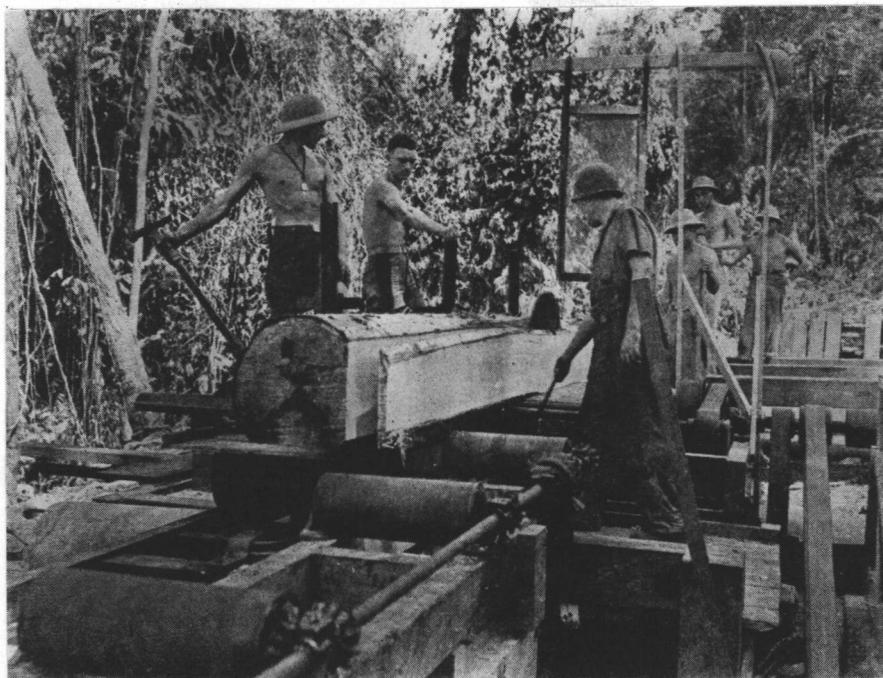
Seabees claim 12,000 board feet per shift with this sawmill.<sup>(9)</sup>
